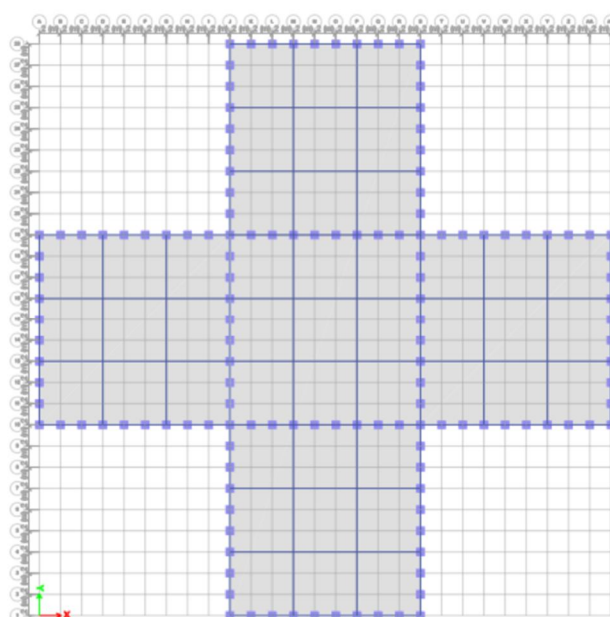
Plan of 21th to 30th storey of Bundled tube structure
